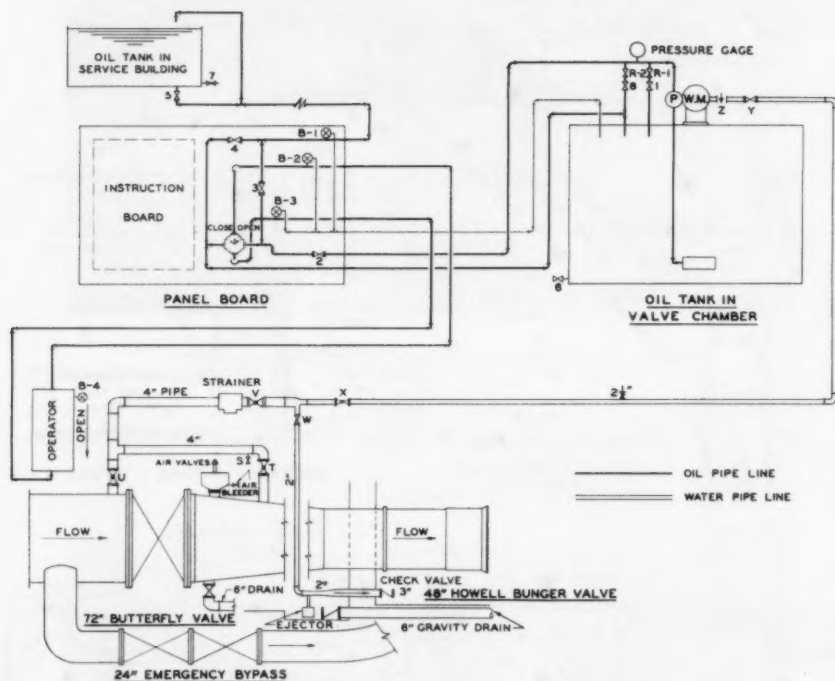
SCHEMATIC ARRANGEMENT OF CONTROL SYSTEM - COURTRIGHT OUTLET
